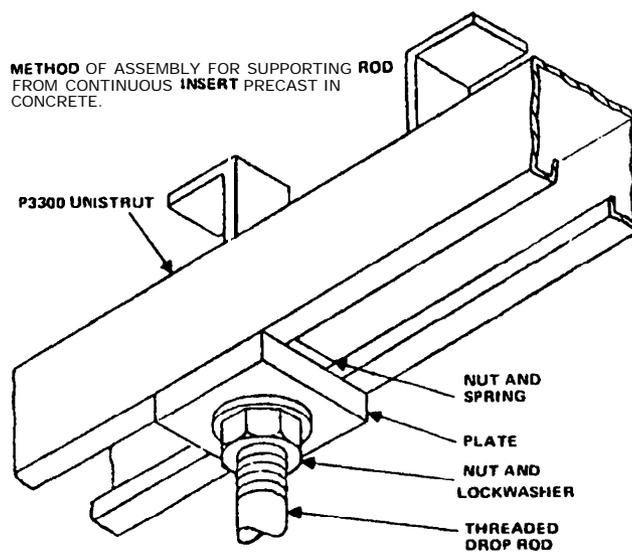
Typical Method of Fastening Drop Rod to UNISTRUT Insert.
